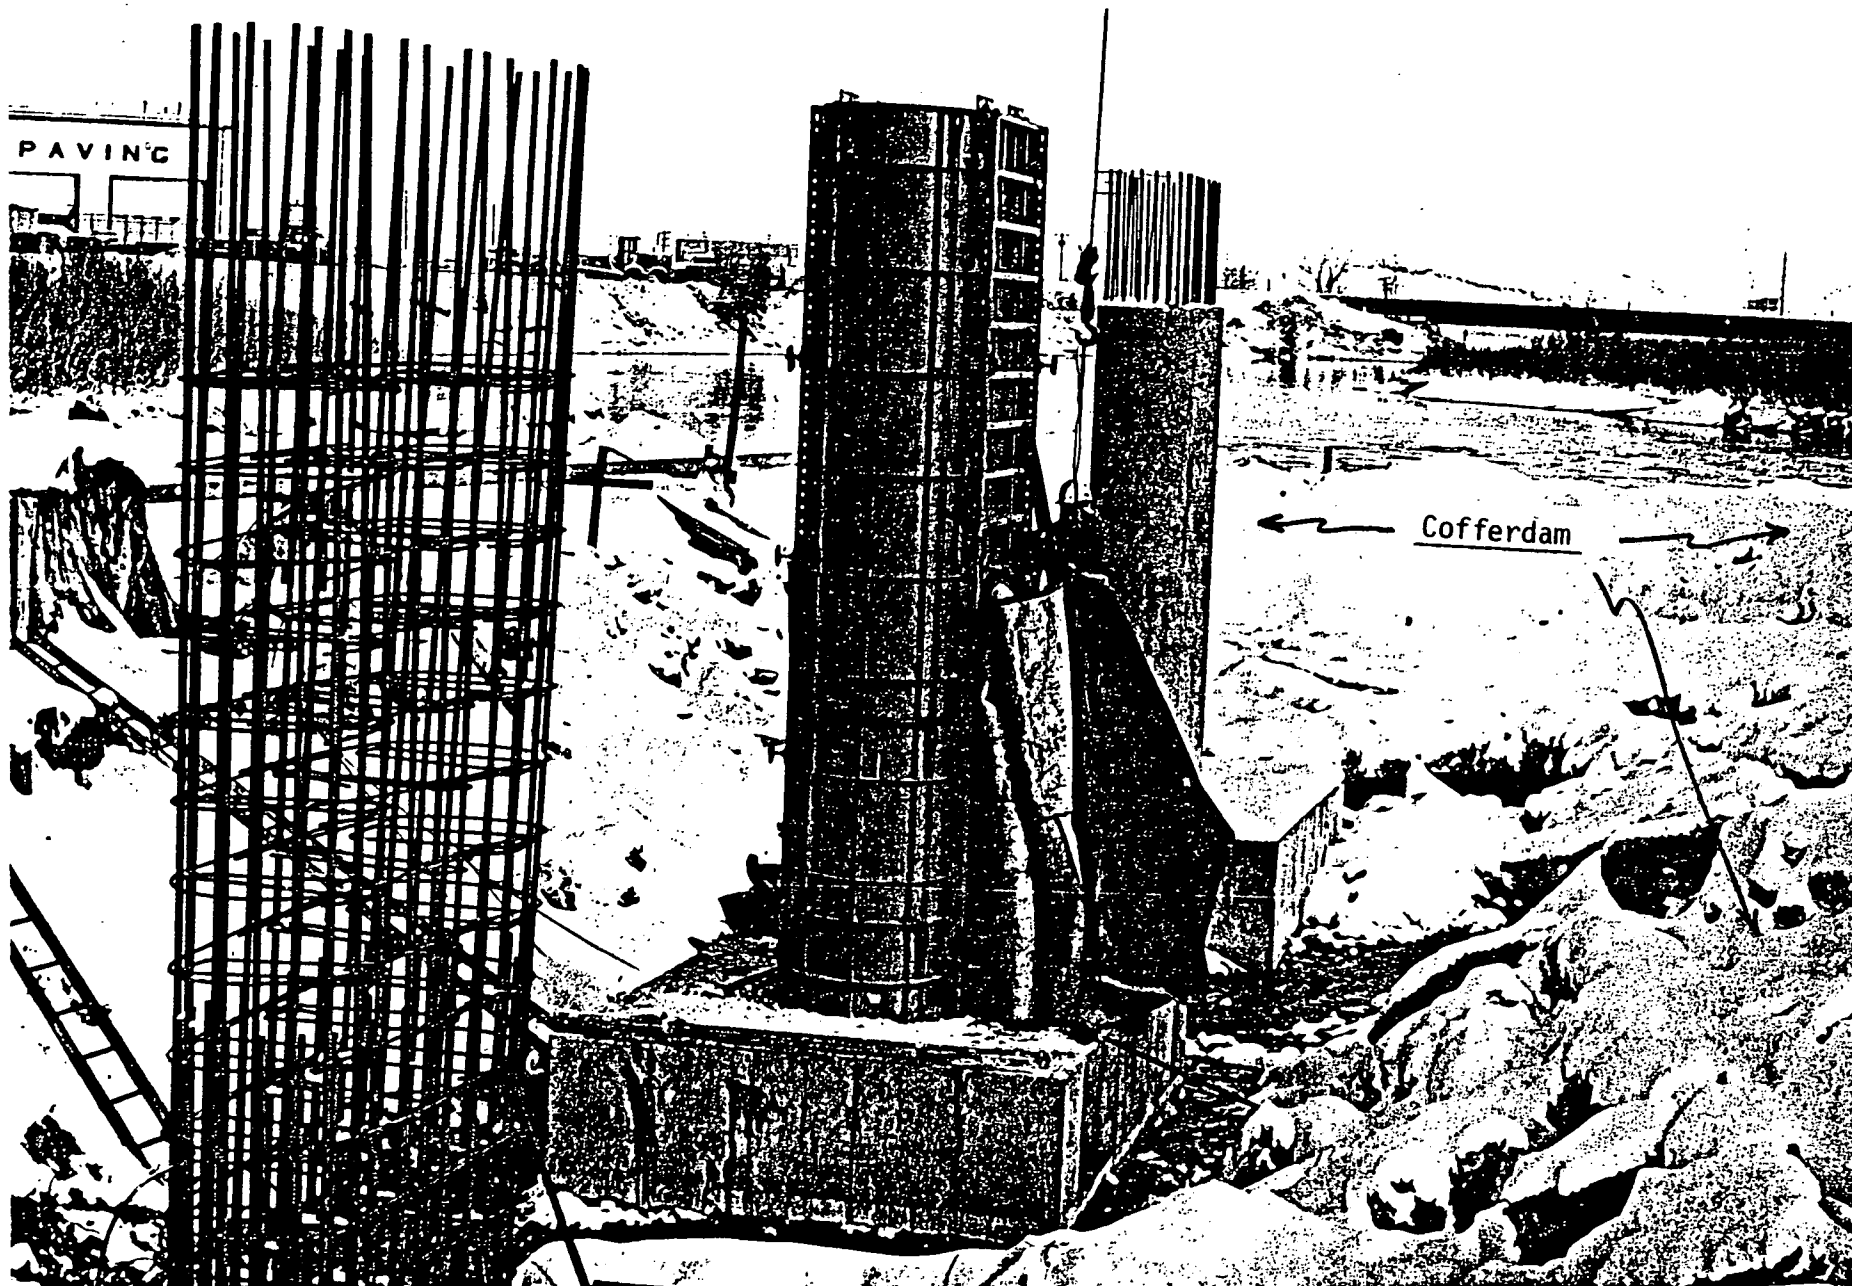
Small, Easily-Constructed Earthfill Cofferdam Used to Exclude Water During Construction of Bridge Piers. (Wyoming Highway Department)
